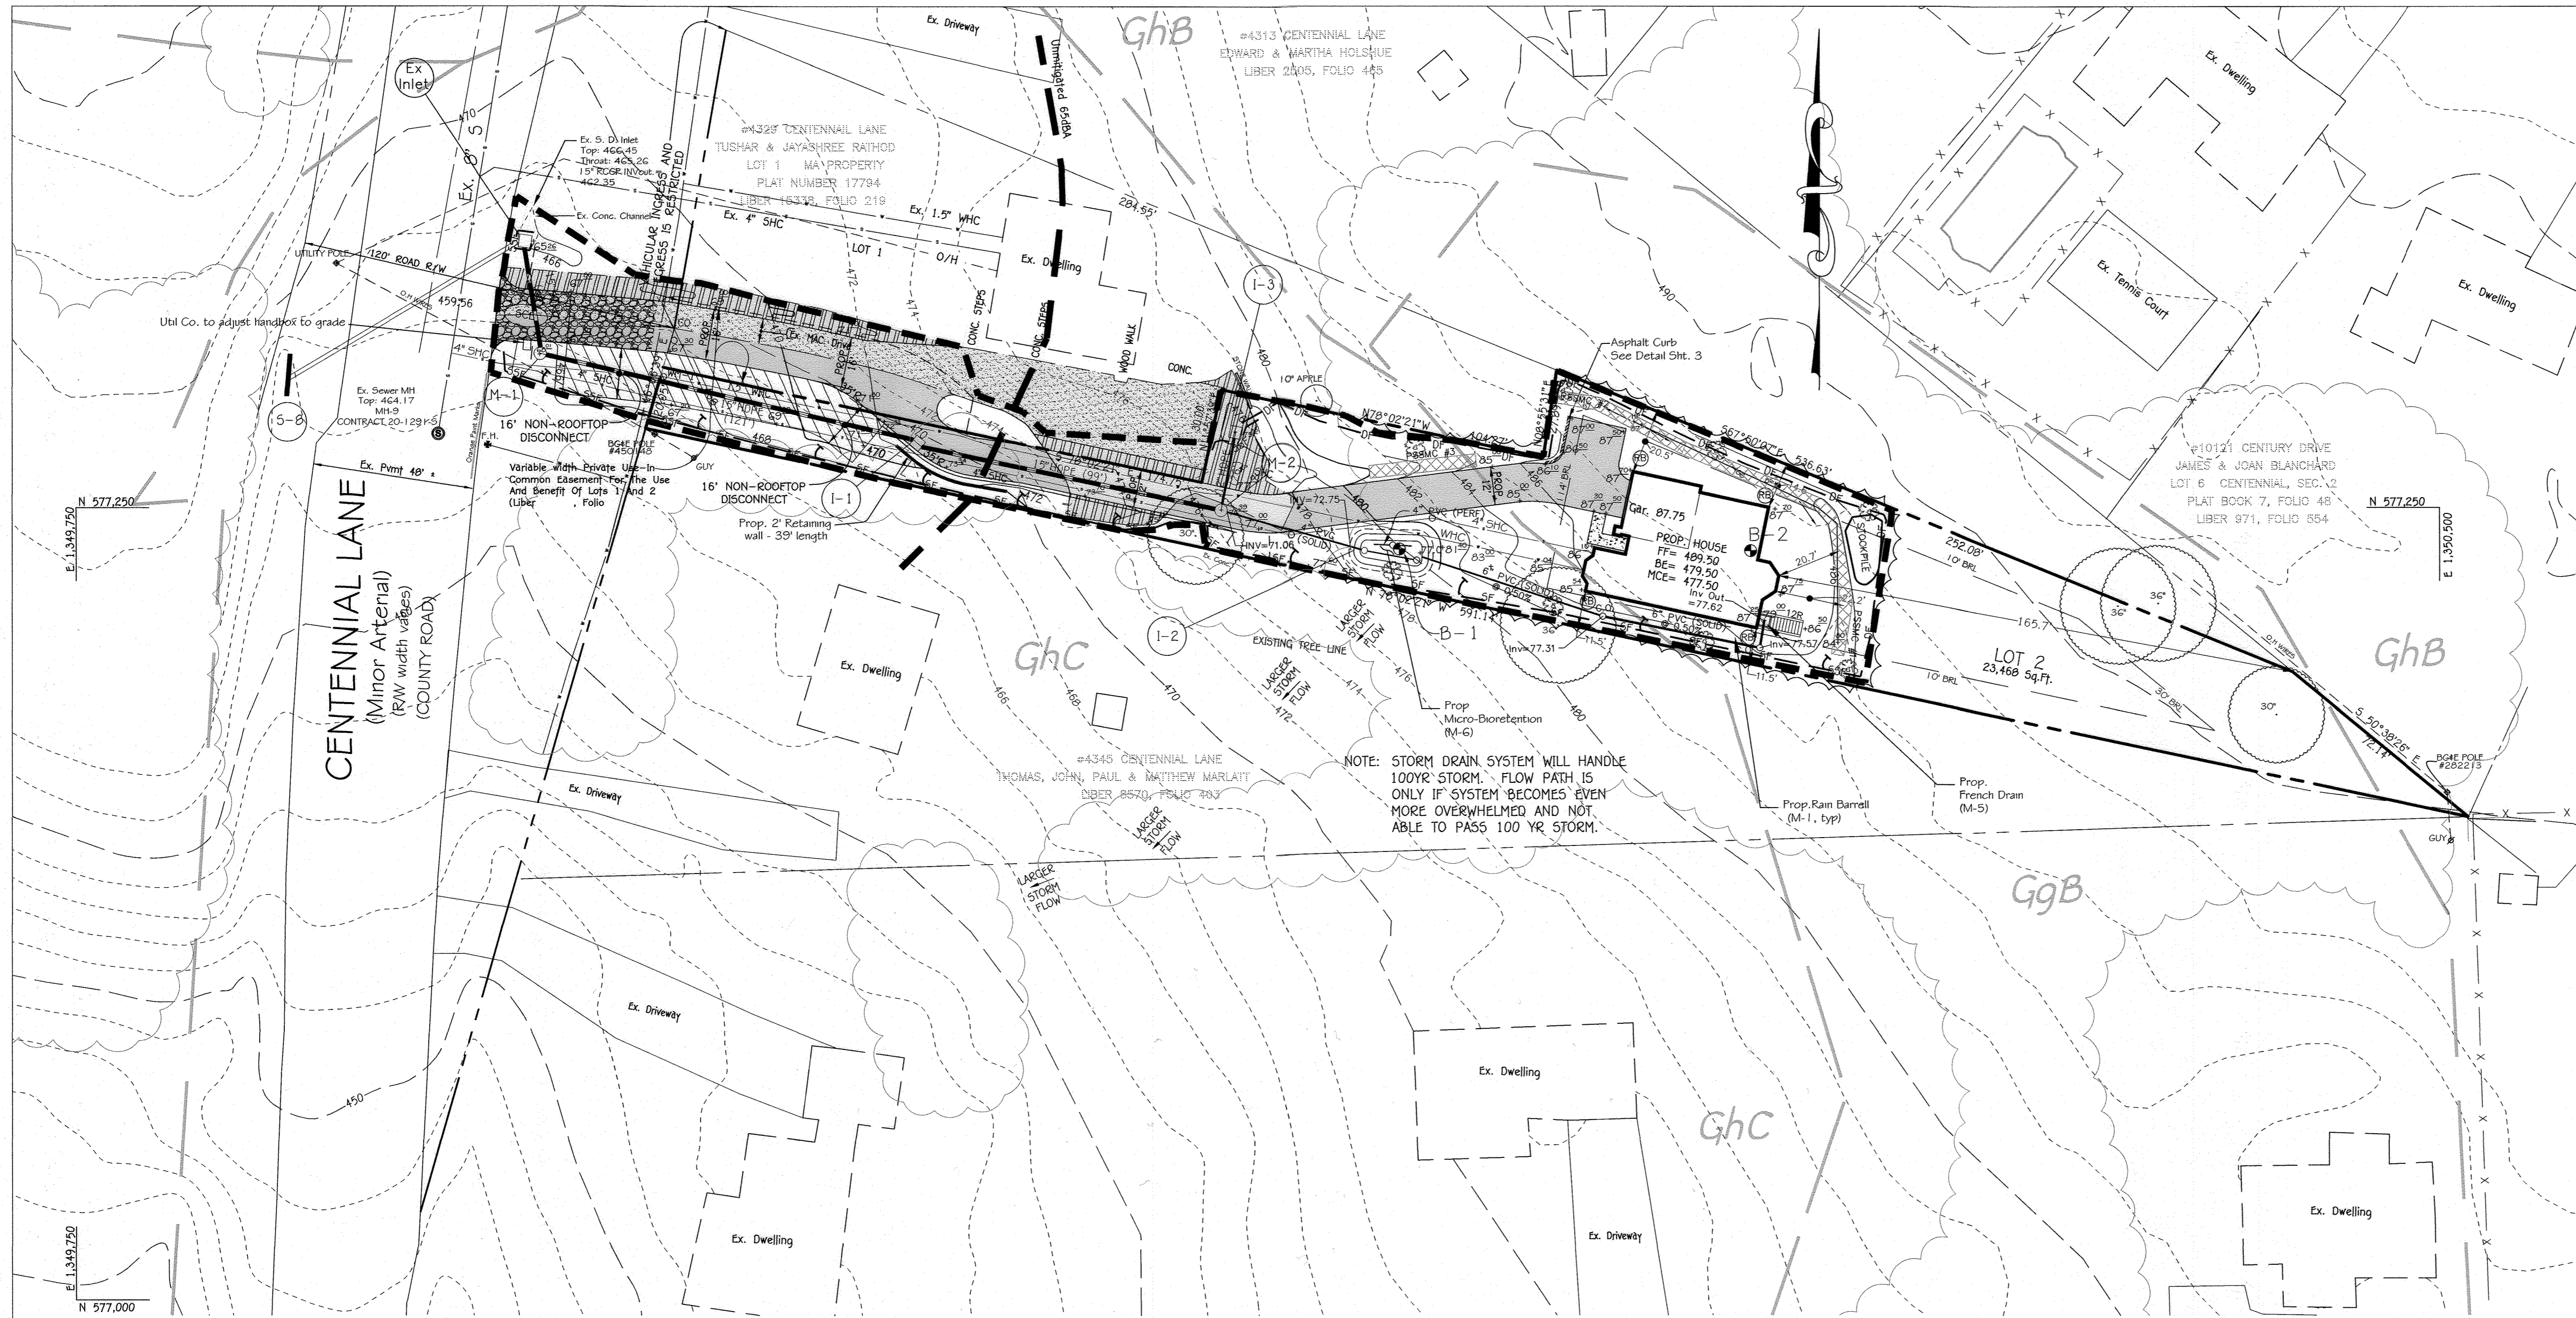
DETAIL SHEET, STORM DRAIN PROFILE & DRAINAGE AREA MAP
